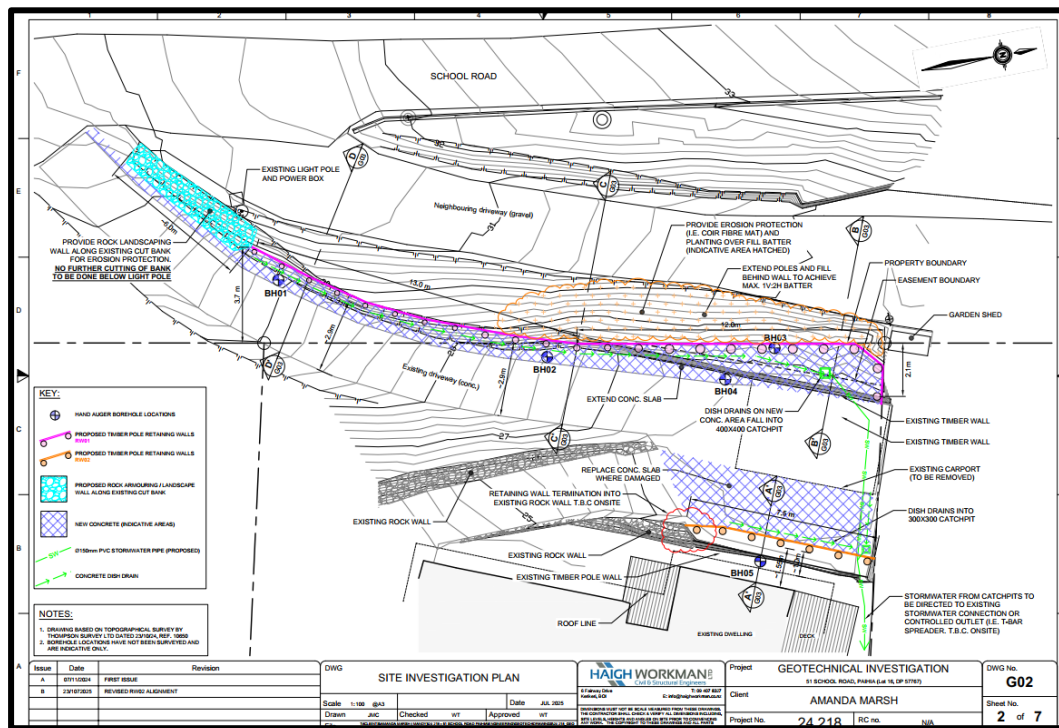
Site plan and images showing location of existing and proposed retaining walls. Image taken from Haigh Workman Report.
